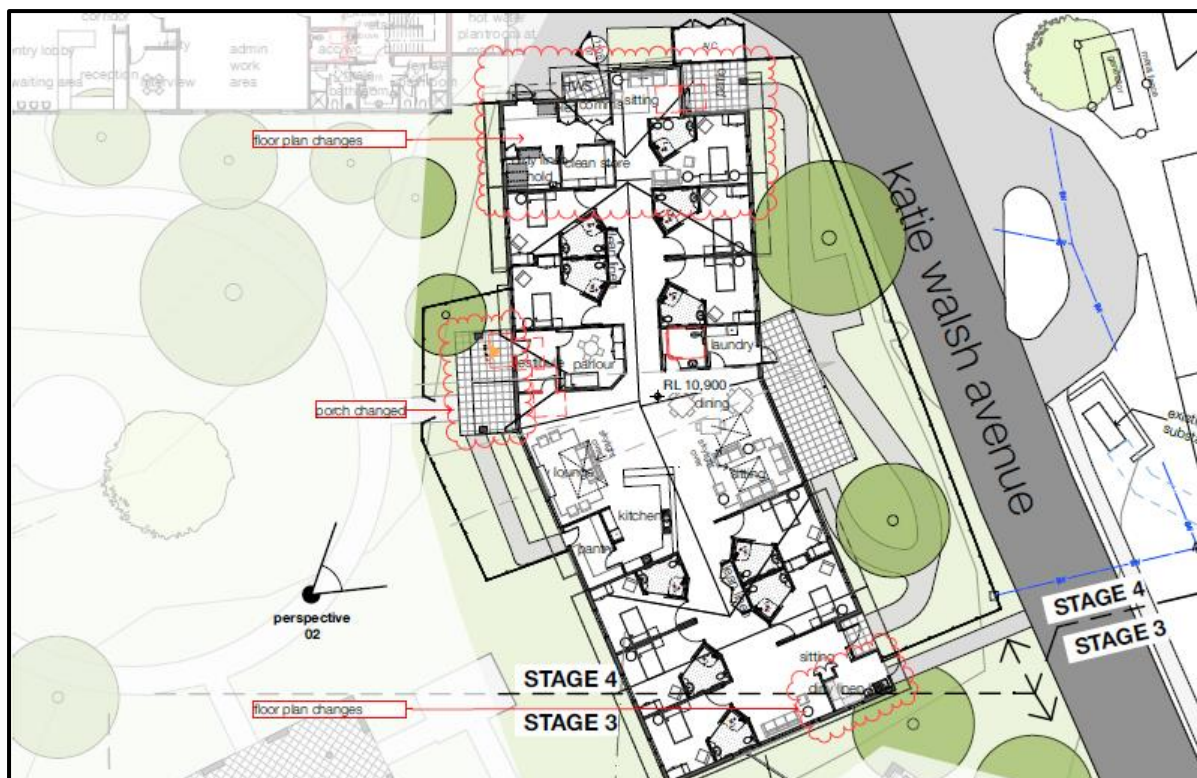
Approved B11 Ground Floor Plan for DA-1183/2016/A
